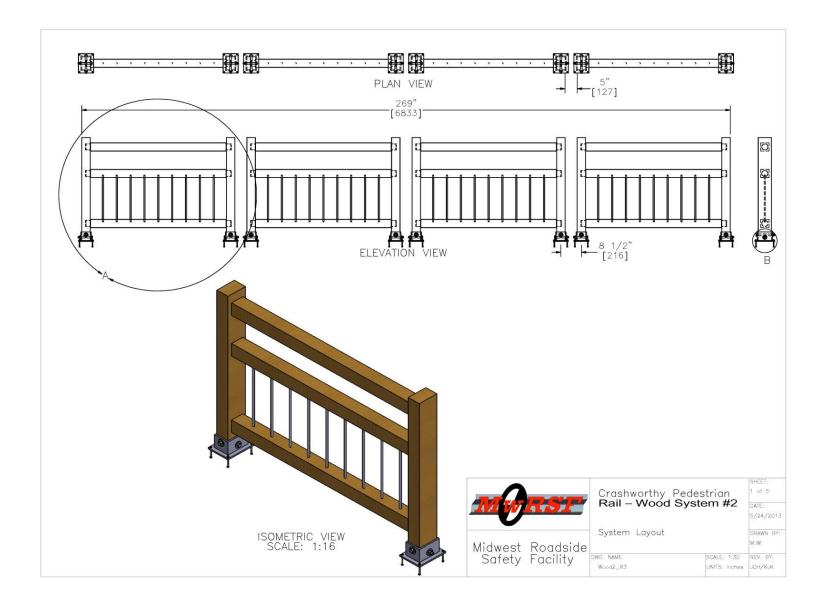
Cutout Wood Rail, Design Concept WOOD2 (Sheet 1 of 5)
